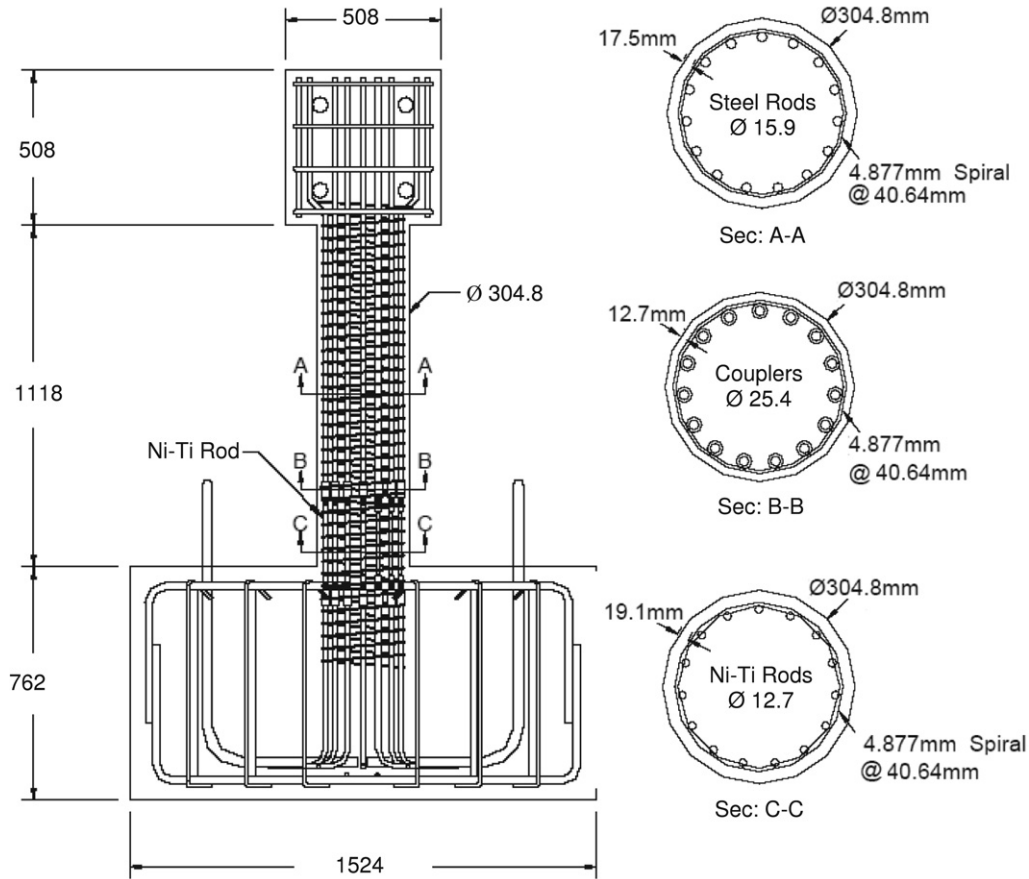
Reinforcement details of SMA RC Column (Saiidi and Wang [14], with permission).
